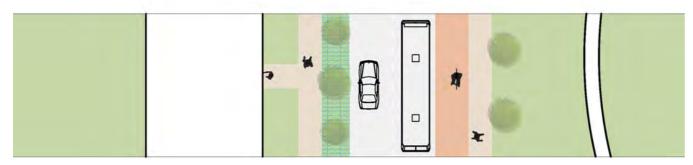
Illustrative section and plan for residential street (shown here within Upper Granton)
